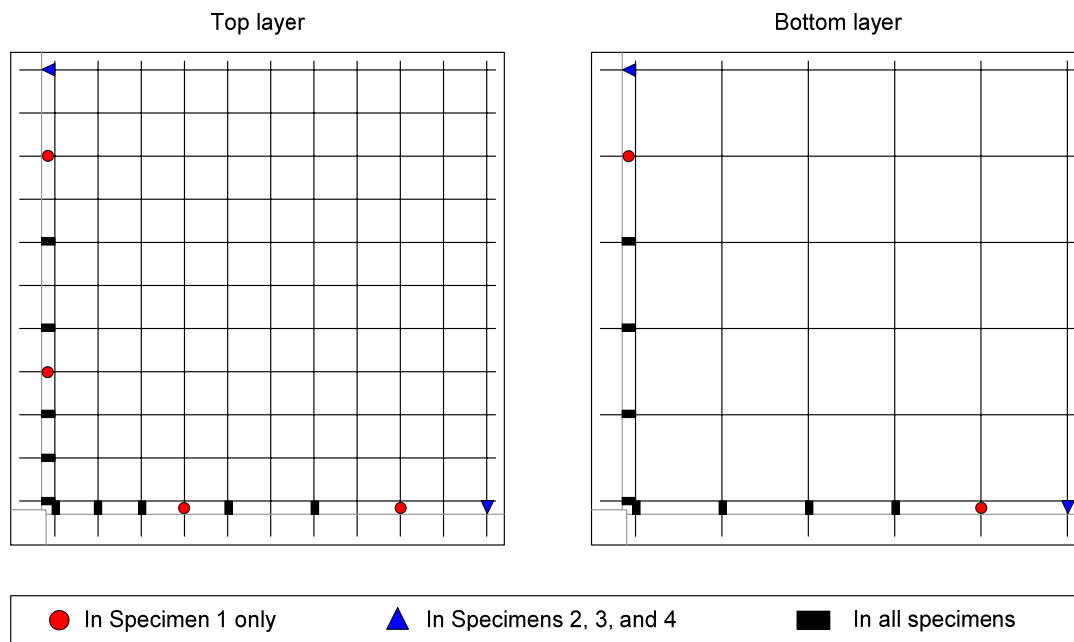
Strain gages mounted on the slab reinforcing bars.
